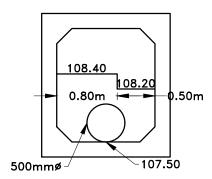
UNDERGROUND STORMWATER WEIR DETAIL
